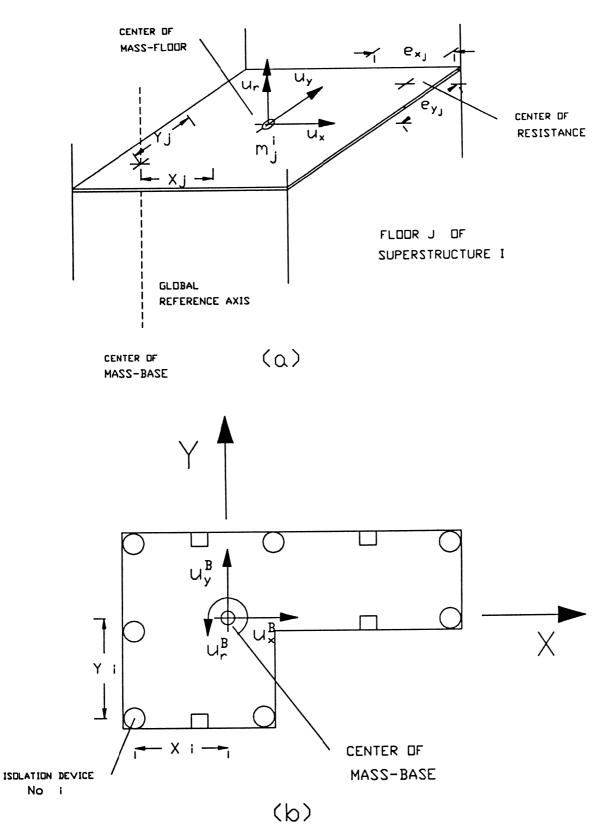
Degrees of Freedom and Details of a Typical Floor and Base : (a) Isometric View of Floor j of Superstructure i; (b) Plan of Base.
